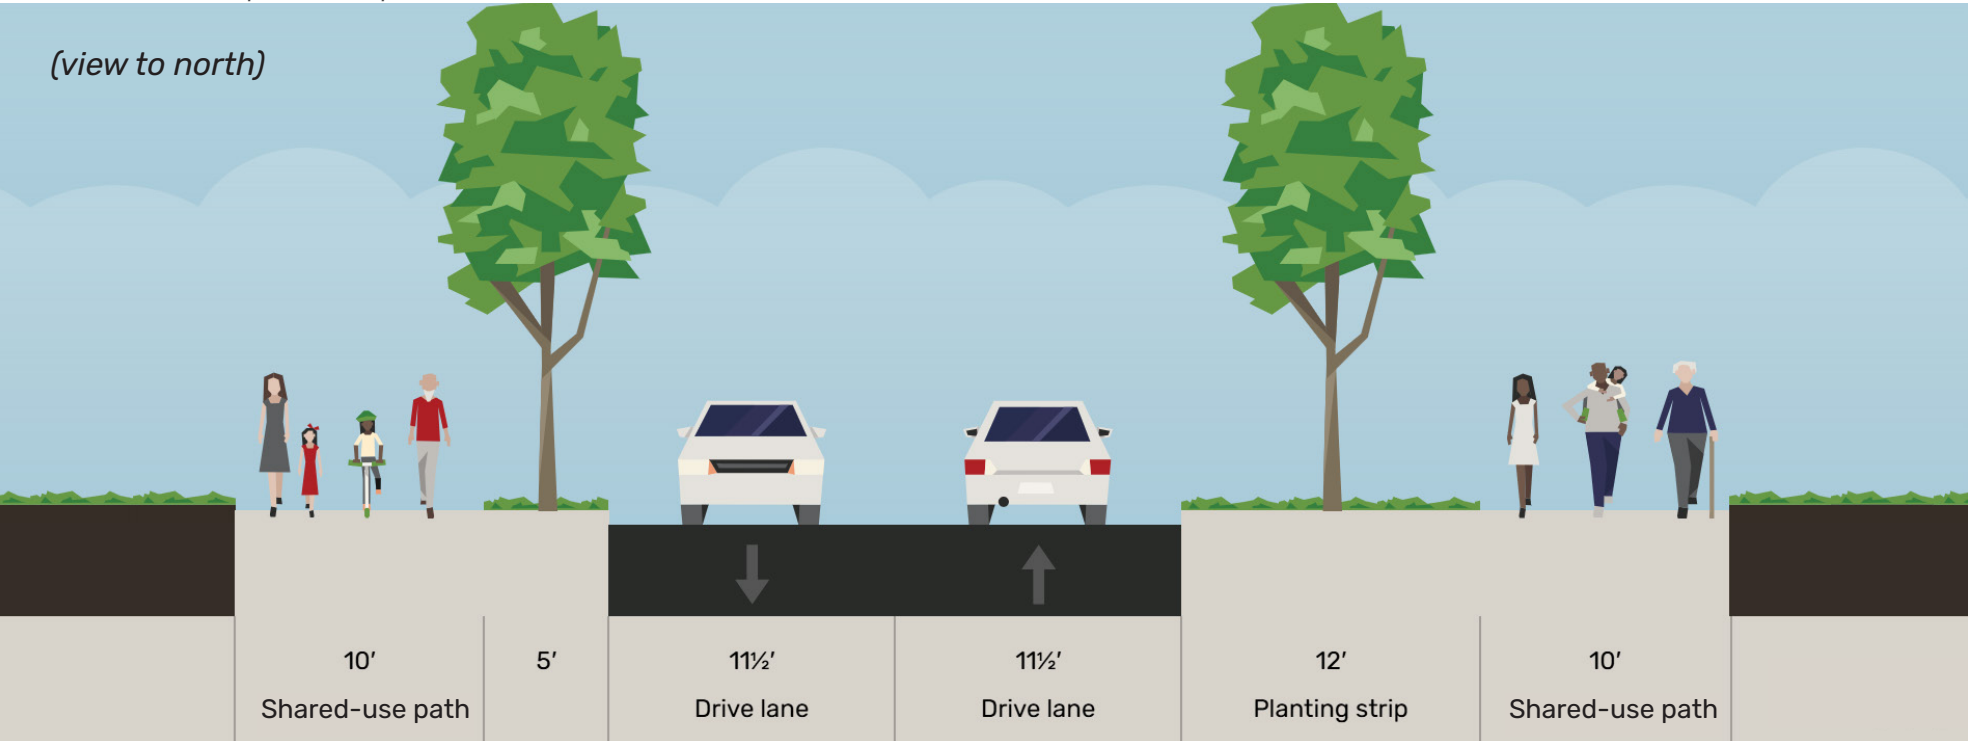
Proposed Typical Cross-Section on Tower Ridge Drive (Brookview Drive to Meadowview Drive) (60' ROW)
